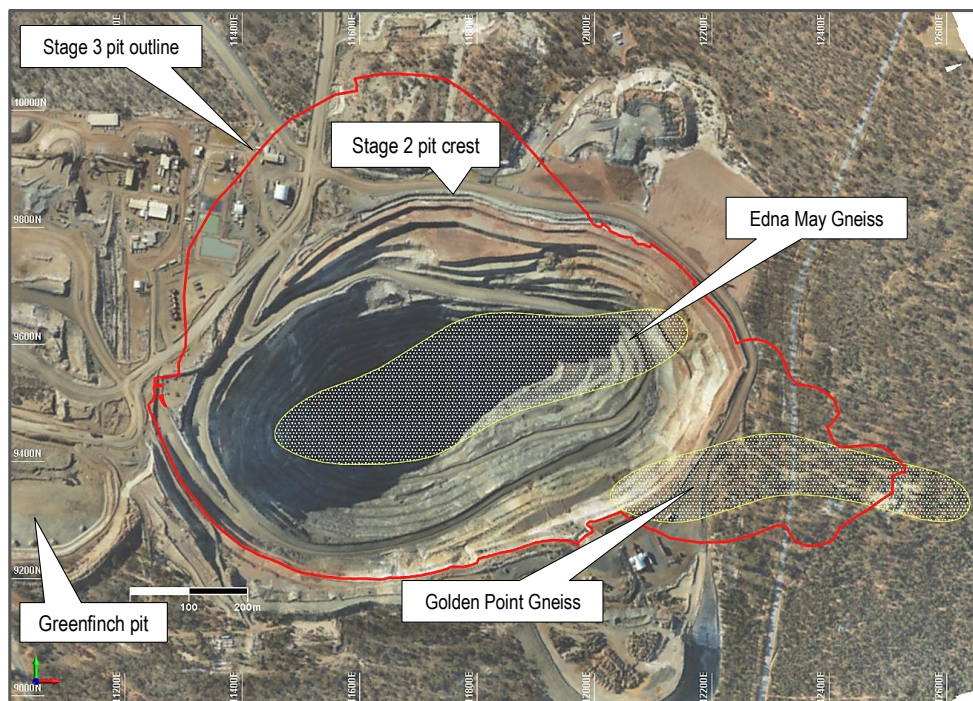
Edna May Plan view – existing pits, Stage 3 pit outline and host gneiss units
